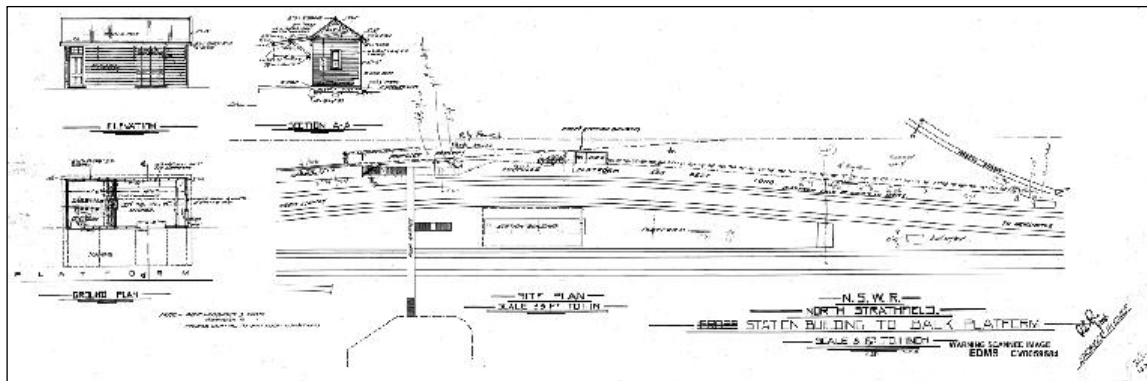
Plan for new platform and platform building at North Strathfield, 1928. (RailCorp Plan, Ref: 0059584)
